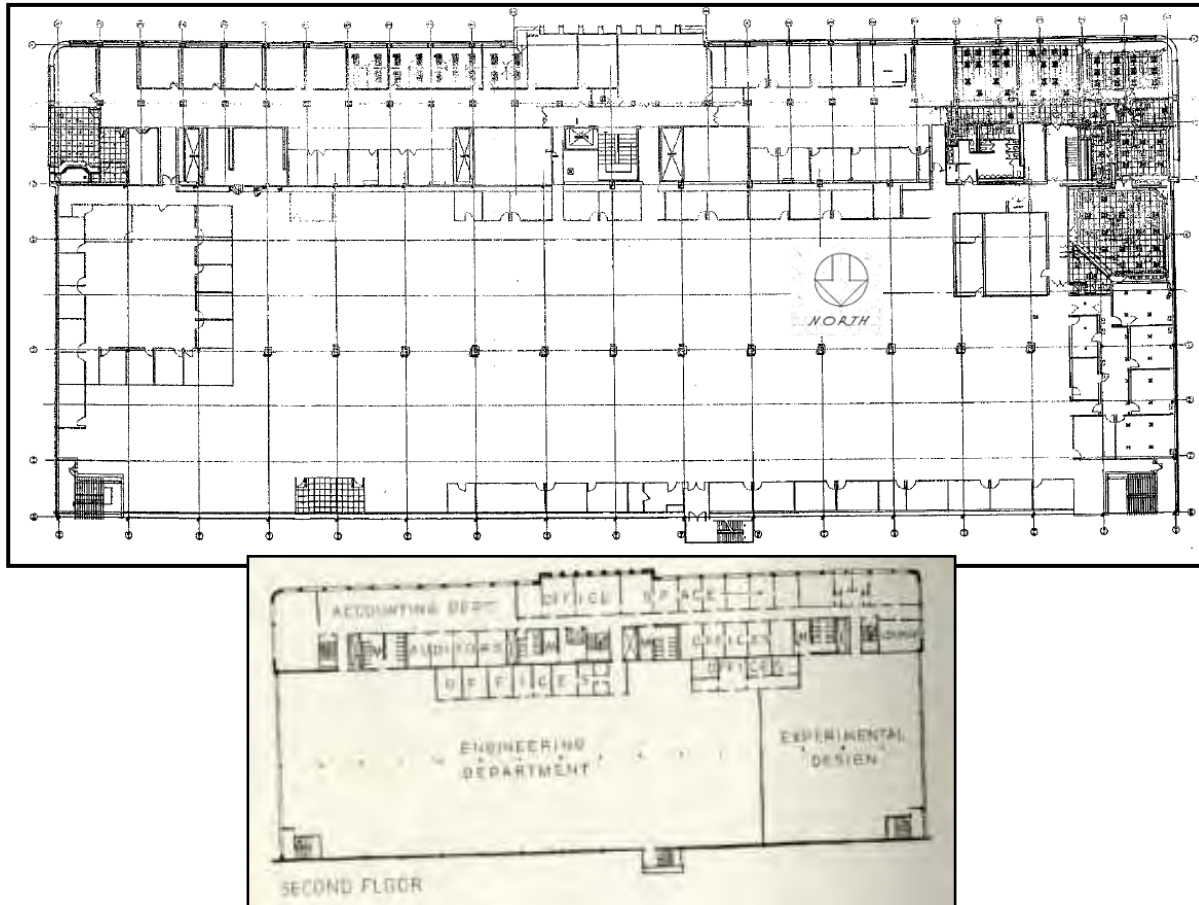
Second floor engineering department skylights. Matt Bivens 3-16.
